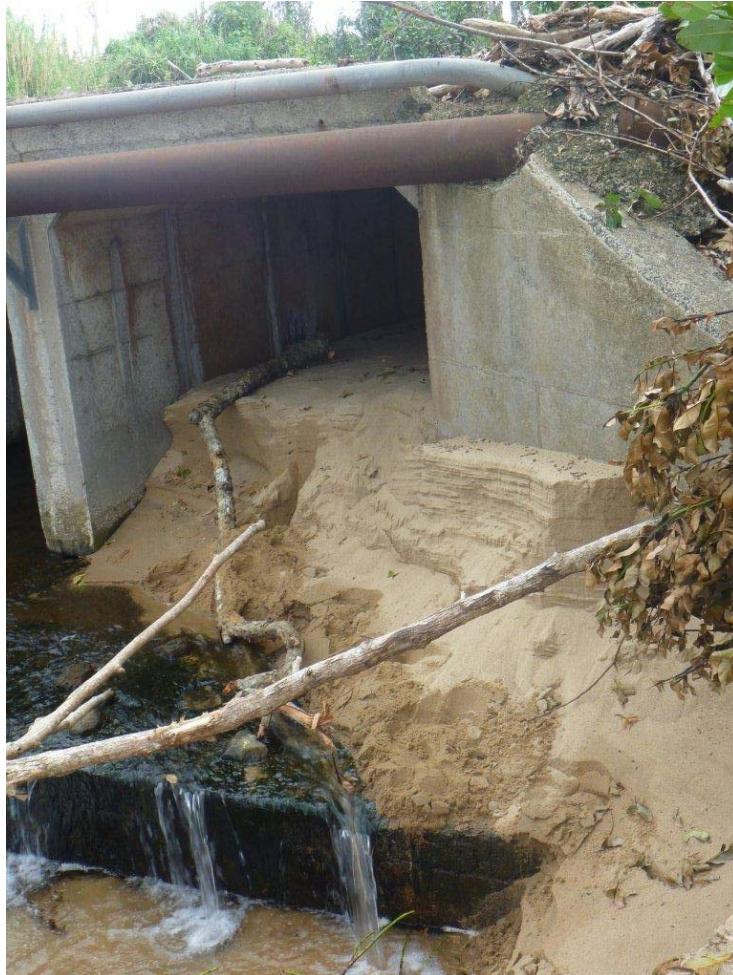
Clump Point Jetty – Sand deposition beneath the road bridge.
